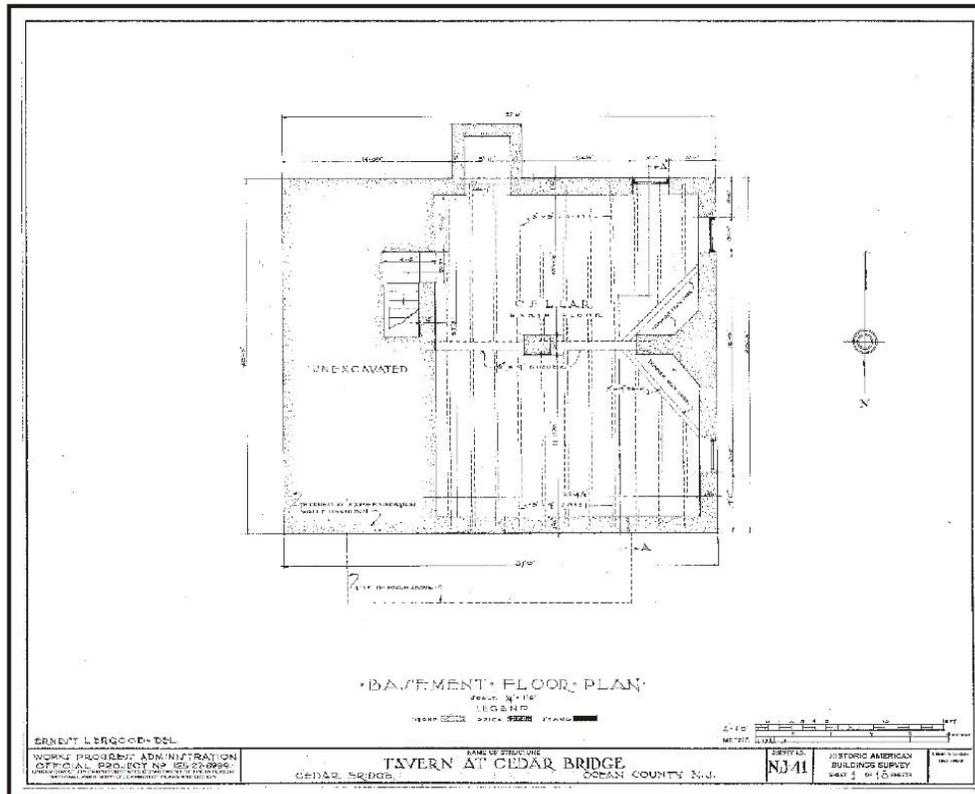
1938 HABS, Basement Floor Plan of the Tavern at Cedar Bridge (Survey No. N.J. 41).
